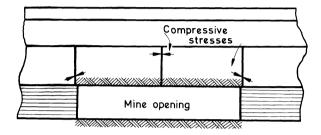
A simple "linear arch" formed by fracture of the roof beam.
